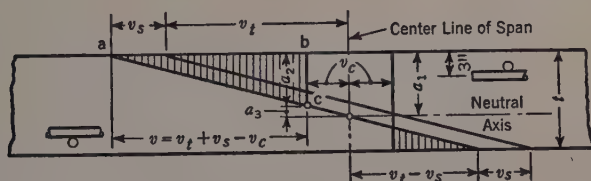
TRANSVERSE REINFORCEMENT IN A DOUBLE-SPAN STRUCTURE
